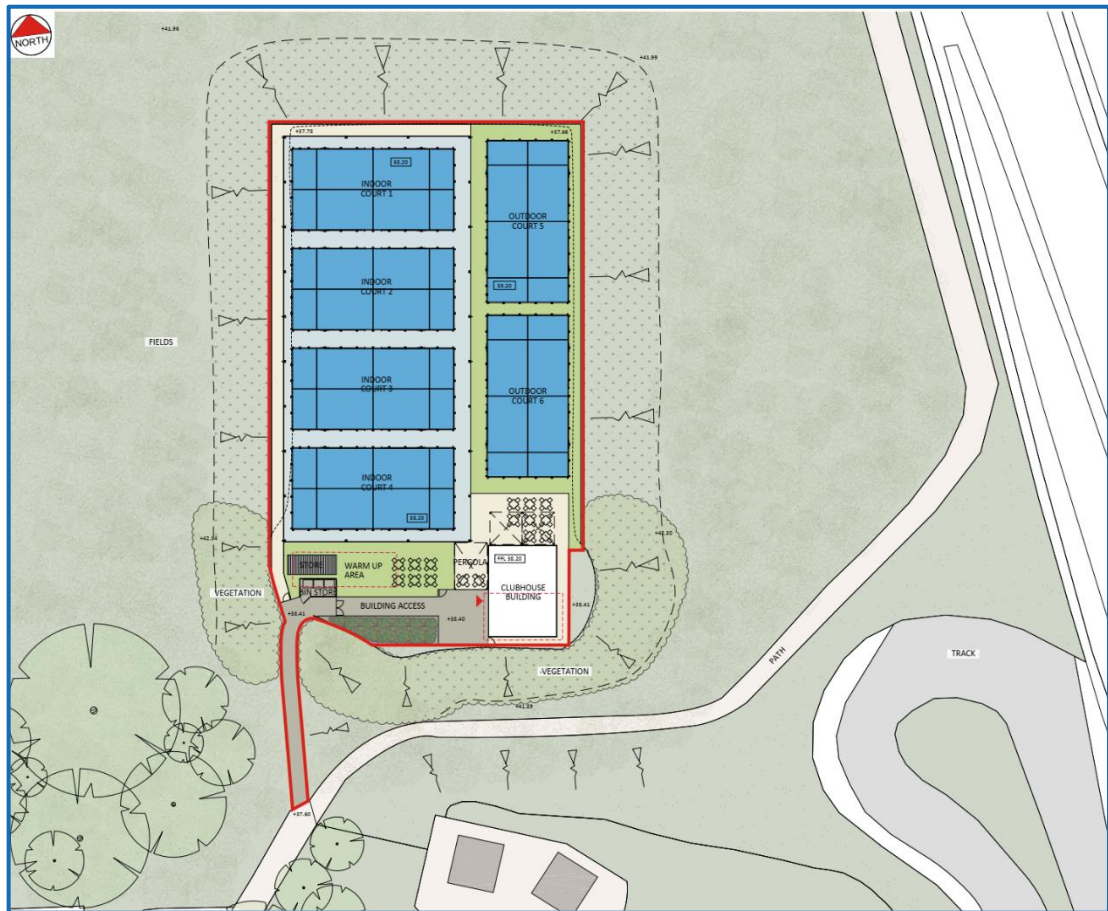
Proposed Development Site layout plan (from Saunders Architects drg. 10150/P101)
